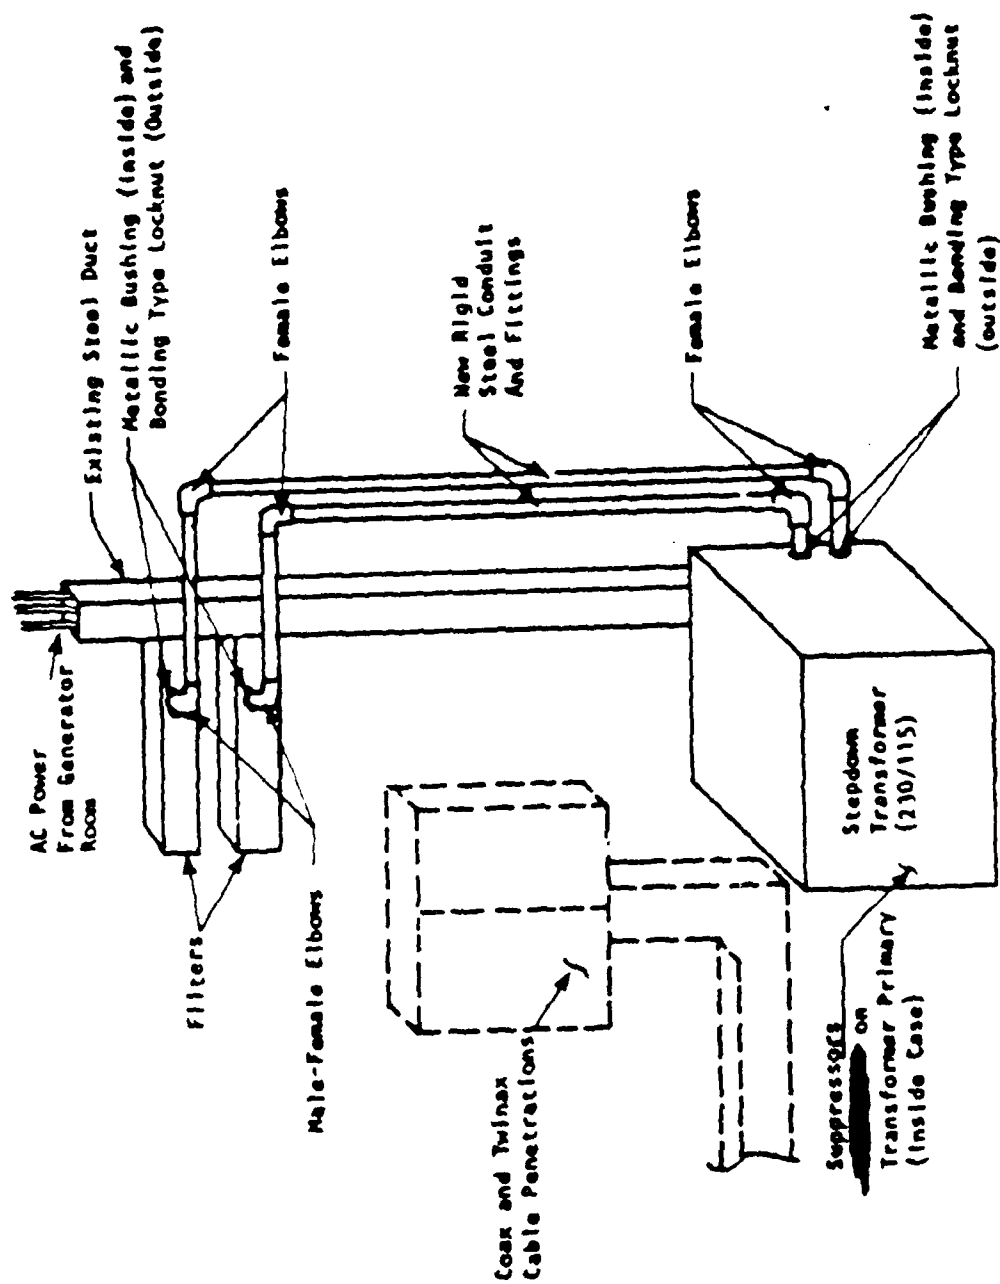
AC power hardening installation; timer room outside wall.
